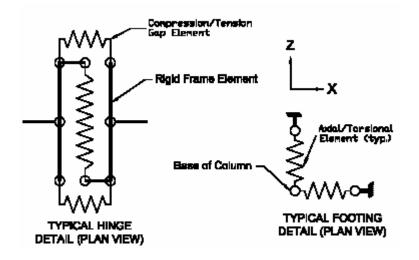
Hinge and Footing Details of Ramp DW Drain 3DX Model
